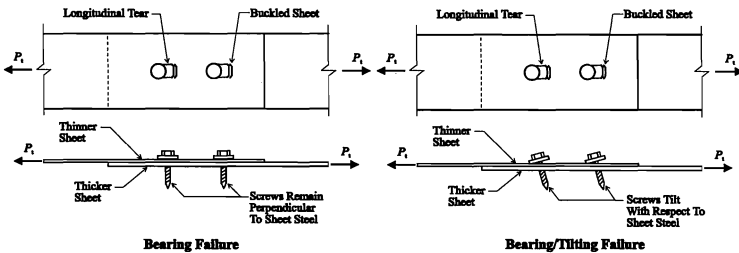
Bearing and Bearing/Tilting Failure Patterns
